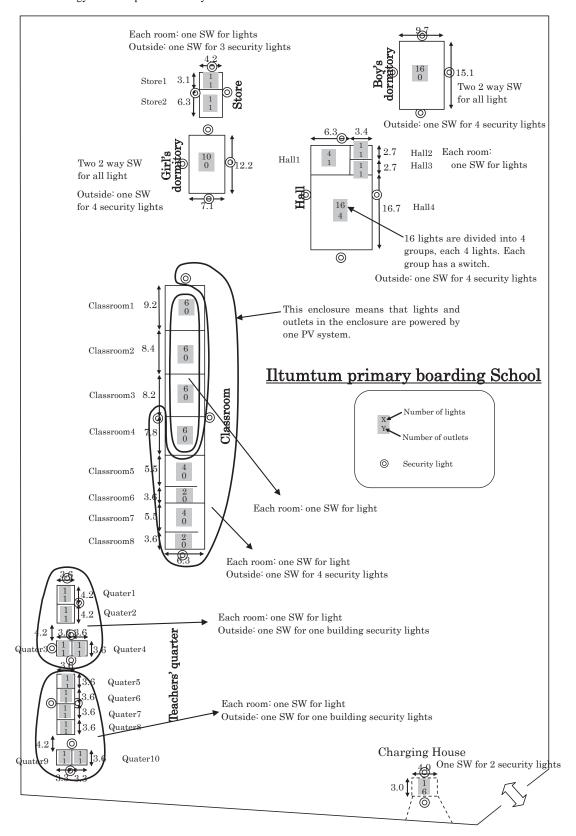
Drawing of Iltumtum primary boarding School (Lot1: Solar PV
